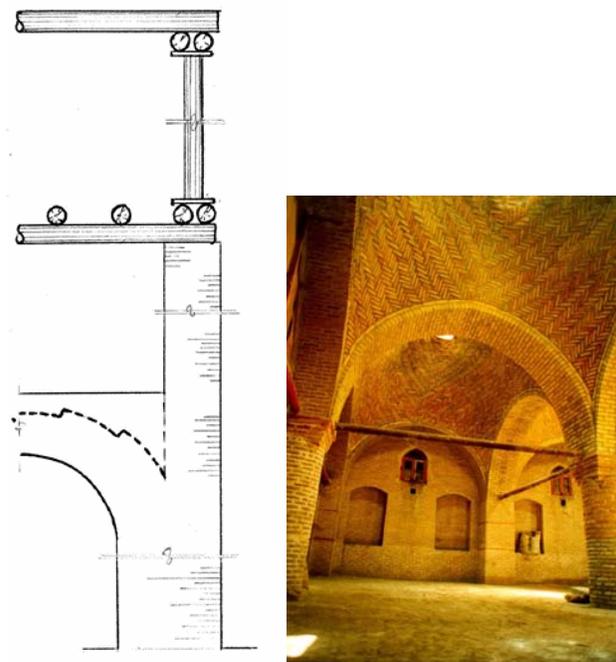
Using lighter material; at the bottom is the stone foundation, at the middle is the brick wall, followed by a wooden and brick roof to cope with bending [14]
